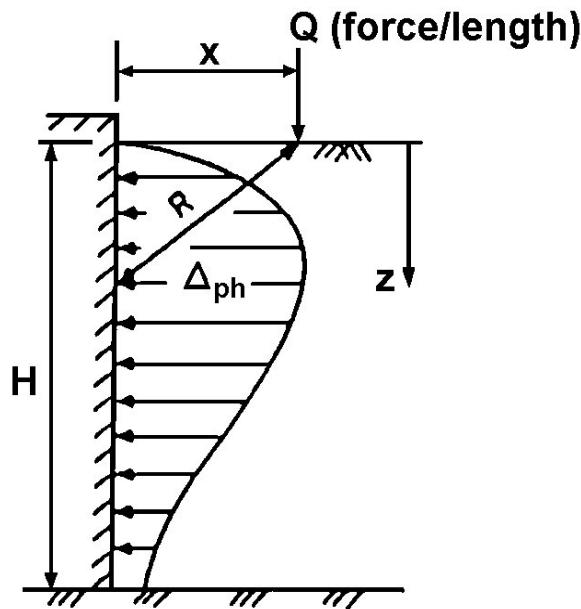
Horizontal Pressure on a Wall Caused by an Infinitely Long Line Load Parallel to the Wall
